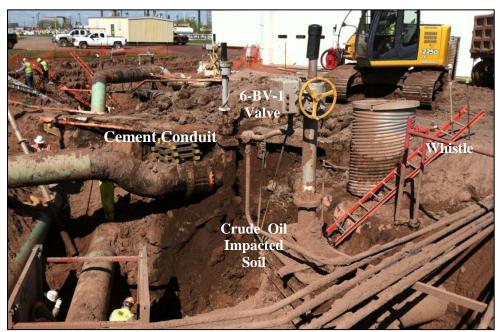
Line 6 hydrotest excavation facing west. Crude impacted soil was observed around the 6-BV-1 valve, the whistle and the the cement conduit as shown in the photo.
